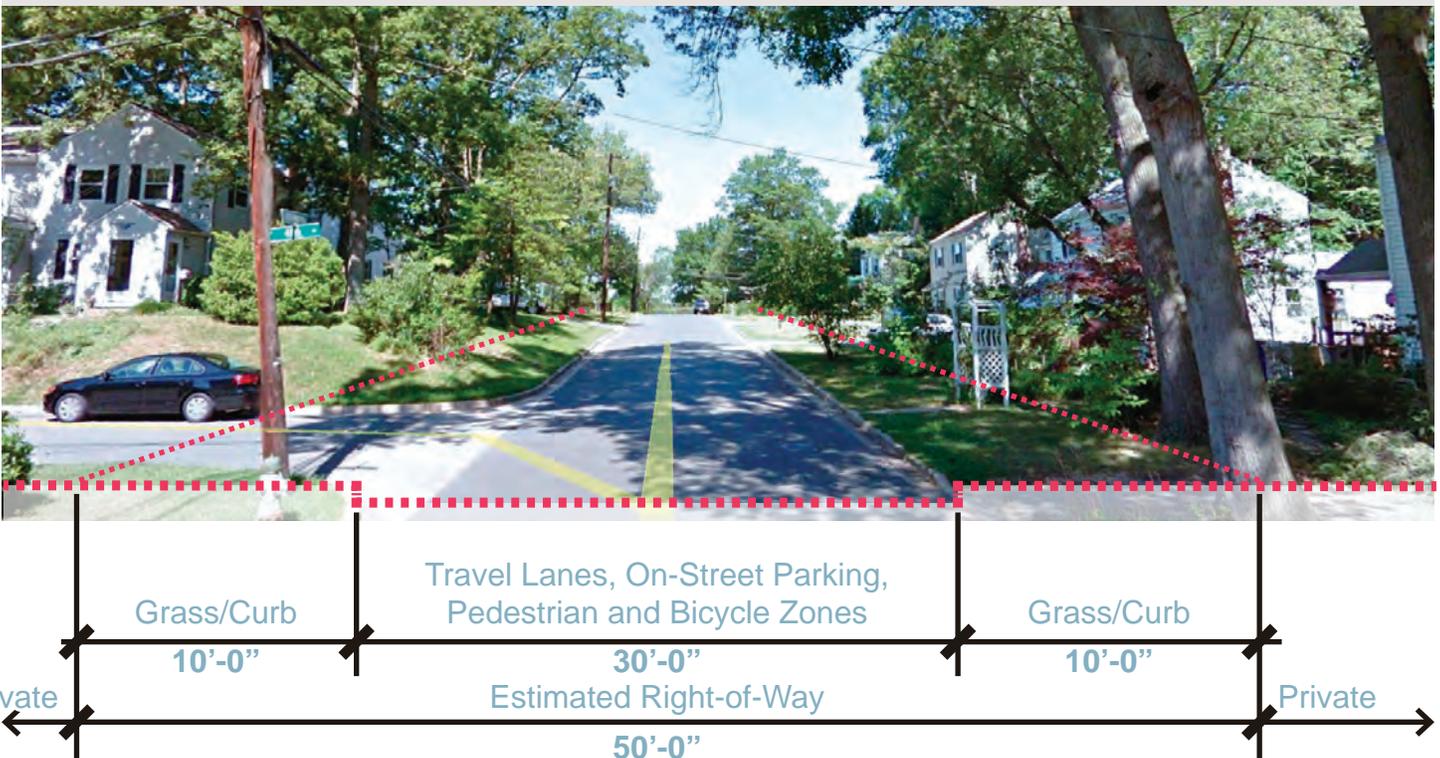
| GUILFORD ROAD (STREET VIEW AND SECTION)
